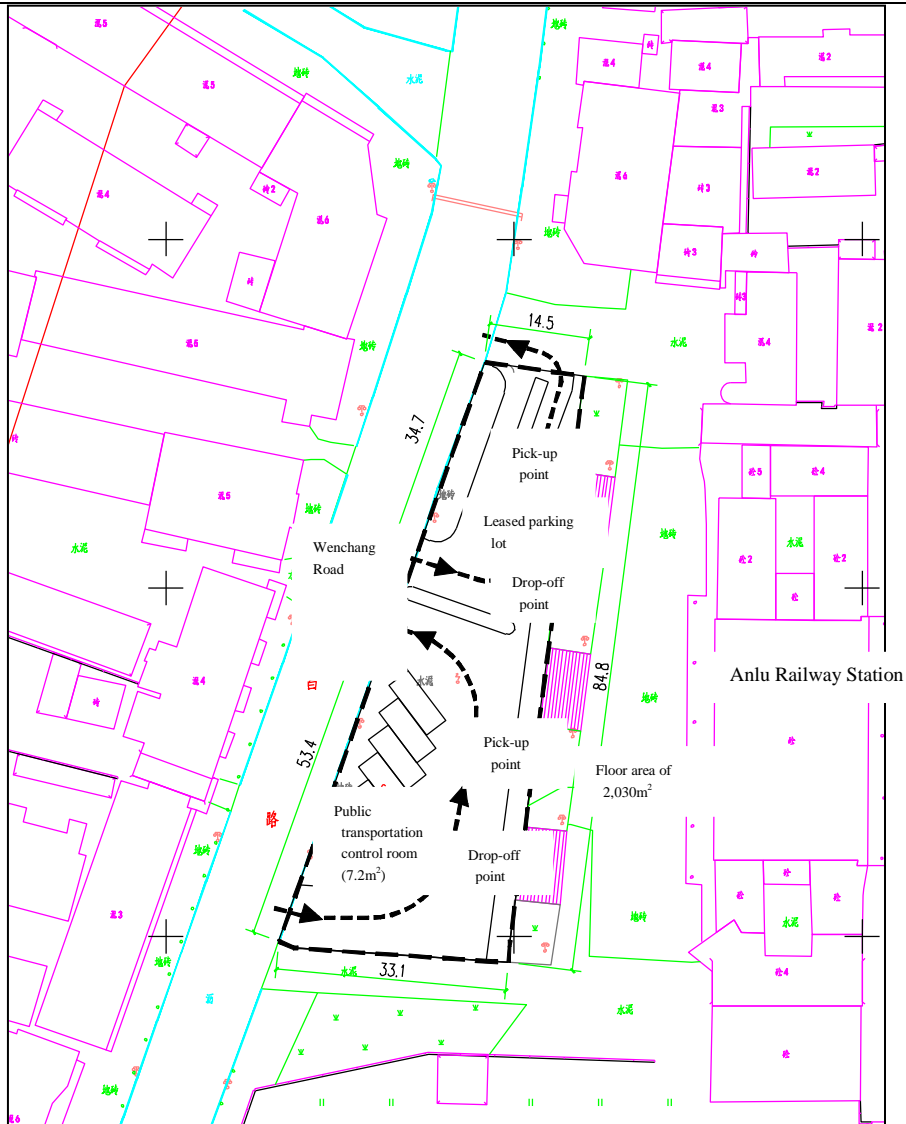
Sketch Map of Plane Layout of Public Transportation Station Terminal of the Railway Station
